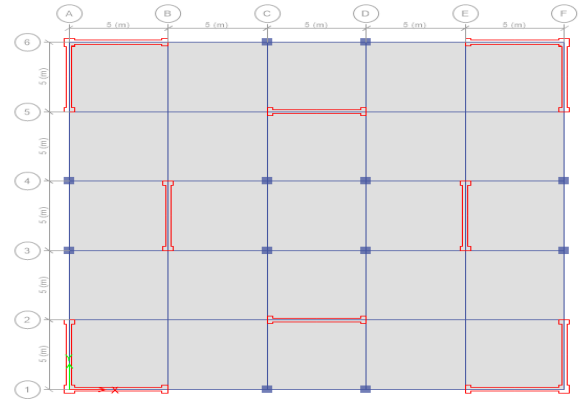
Position of Dumbel Shape Shearwall Building at 1st Grid Type
